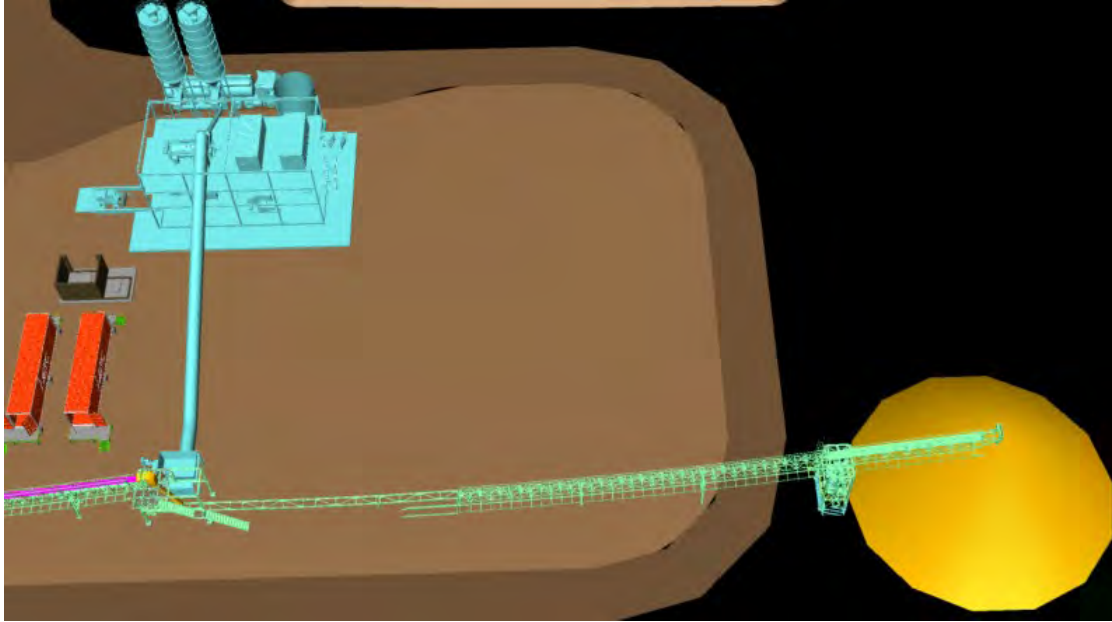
Typical Tailings Disposal and Backfill Paste Plant.
